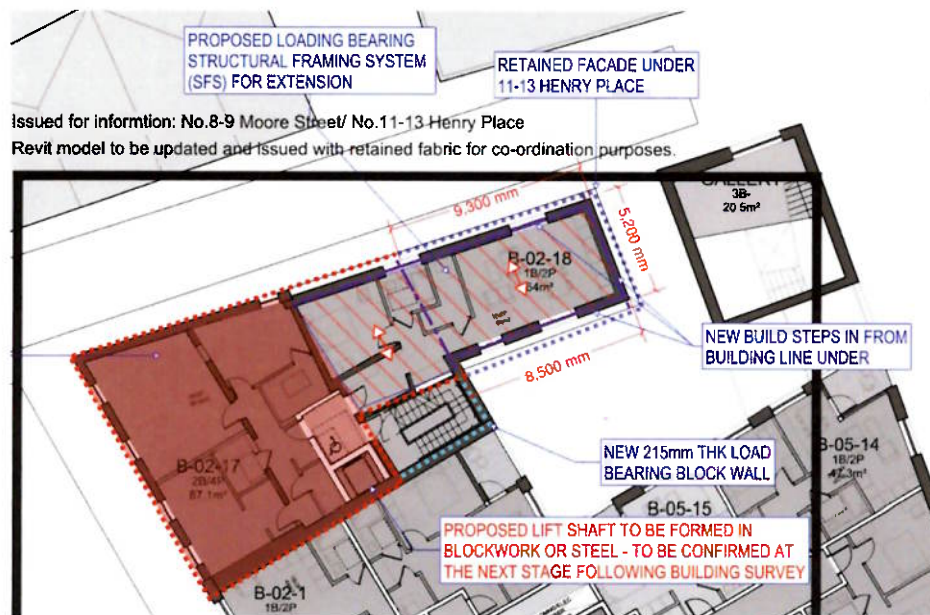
Steel at 2nd Floor to Support Extension Over 11-13 Henry Place.
